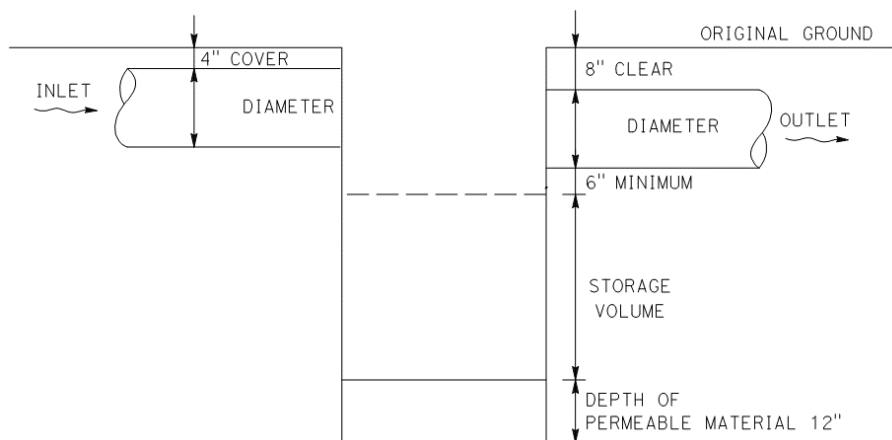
Modified Pipe Inlet TST – Available Storage
